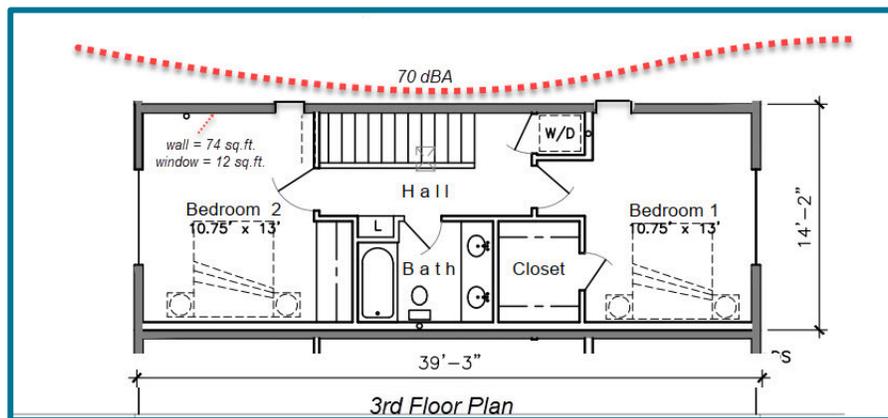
STC 52 exterior stucco wall, STC 30 window, typical
